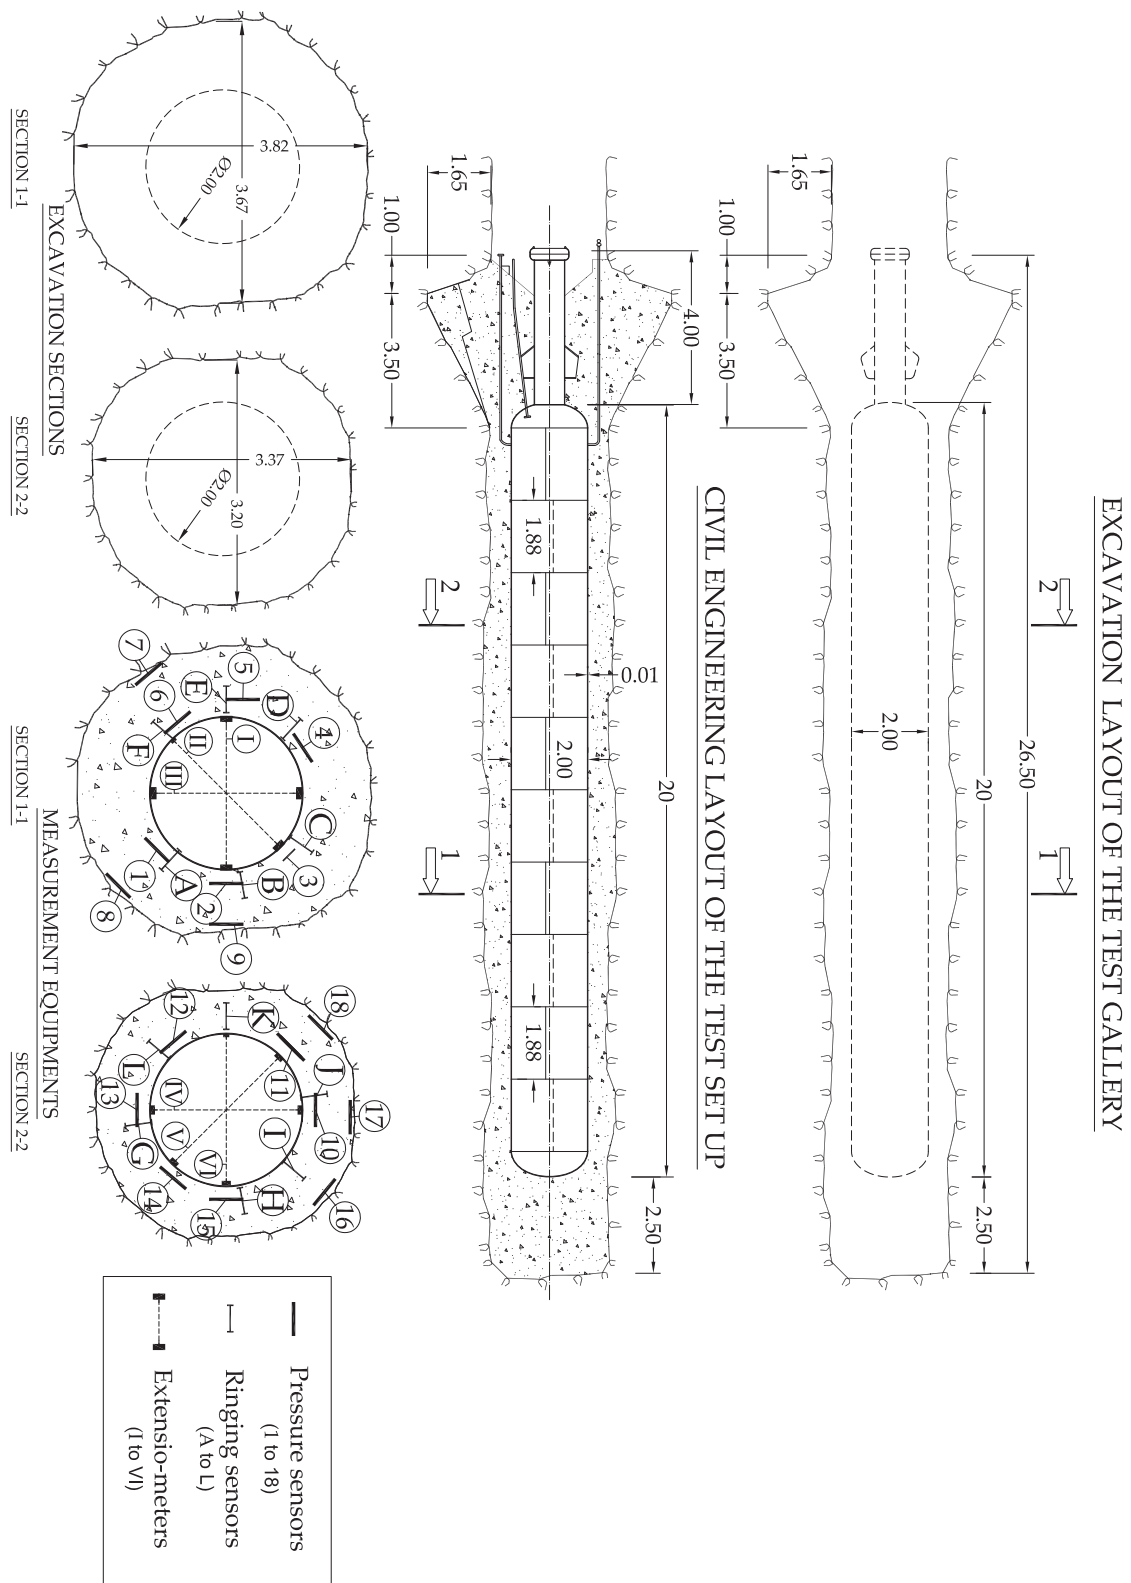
Layout and sections of the test reach of the steel-lined pressure tunnel constructed at the “Super-Bissorte” power plant.
